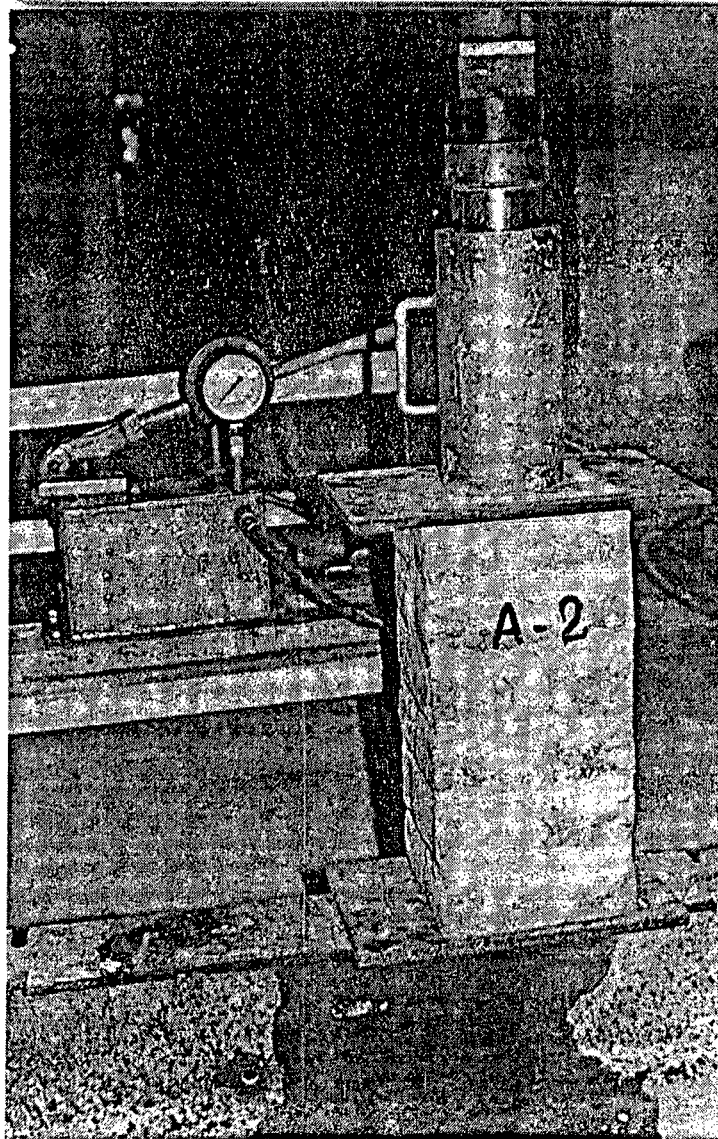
Test Setup for Brick Masonry Prism in Compression
